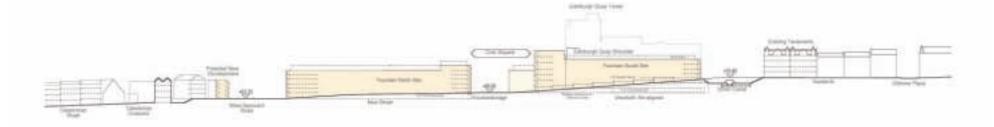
FOUNTAINBRIDGE - Proposed Infrastructure
